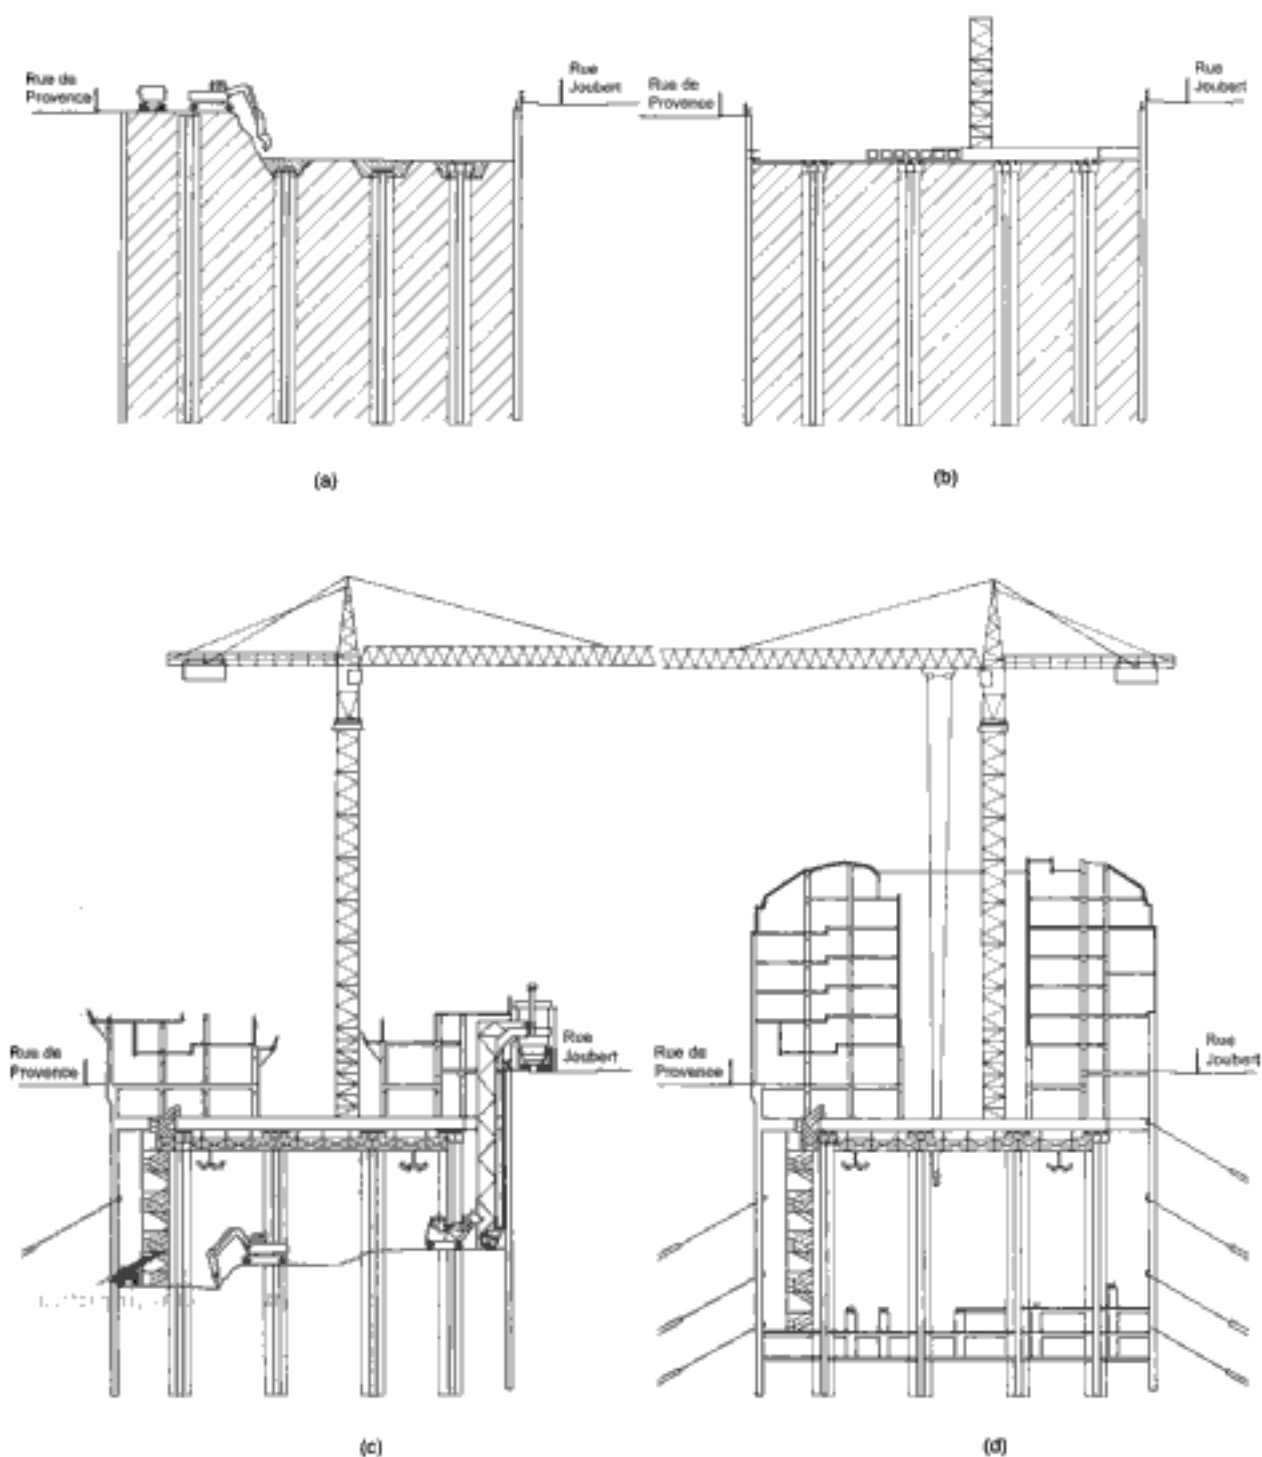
Paris basement construction sequence, Provence Opera, Paris: (a) barrette sections installed; (b) ground floor construction; (c) superstructure construction and excavation below ground floor slab; (d) superstructure and substructure;
